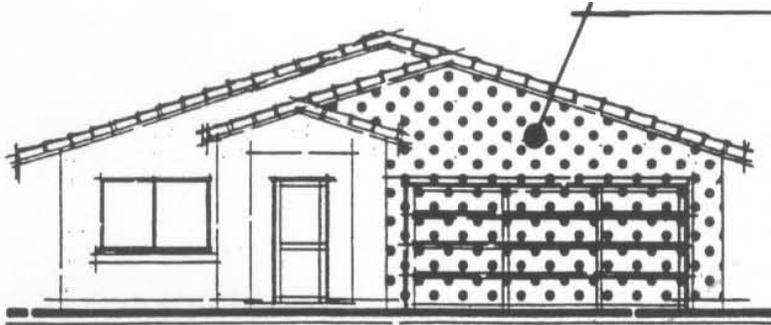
, "Village 1: Building Massing/Single-Story Elements"
